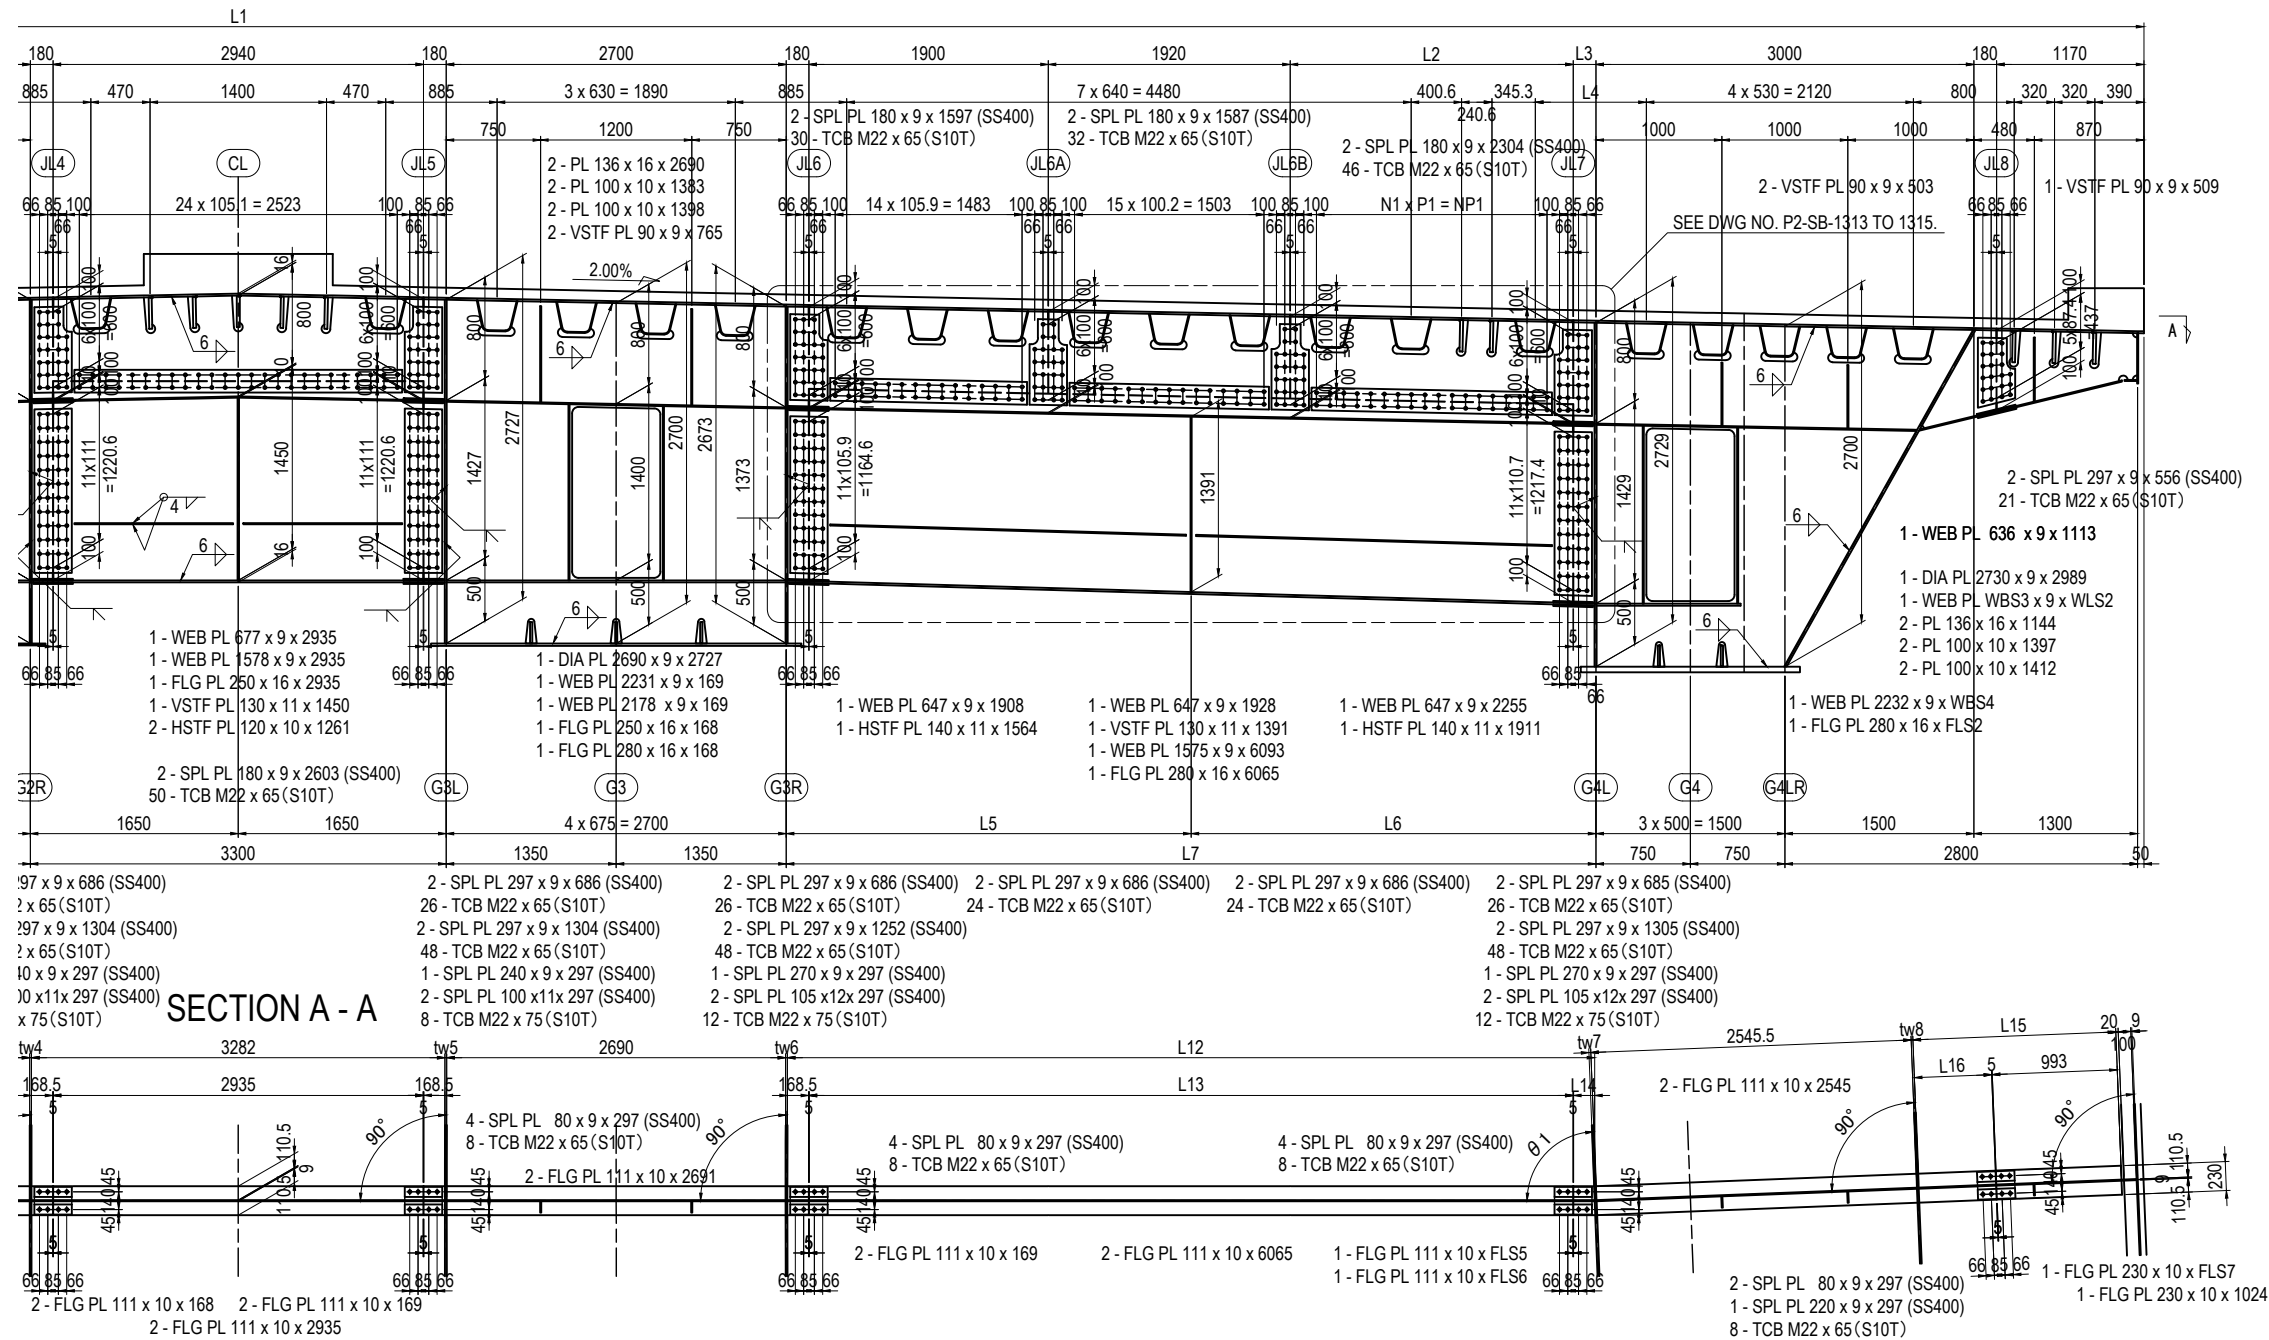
DETAIL OF CROSS GIRDER SECTION (4) S=1:60 C4 TO C12 (1)
